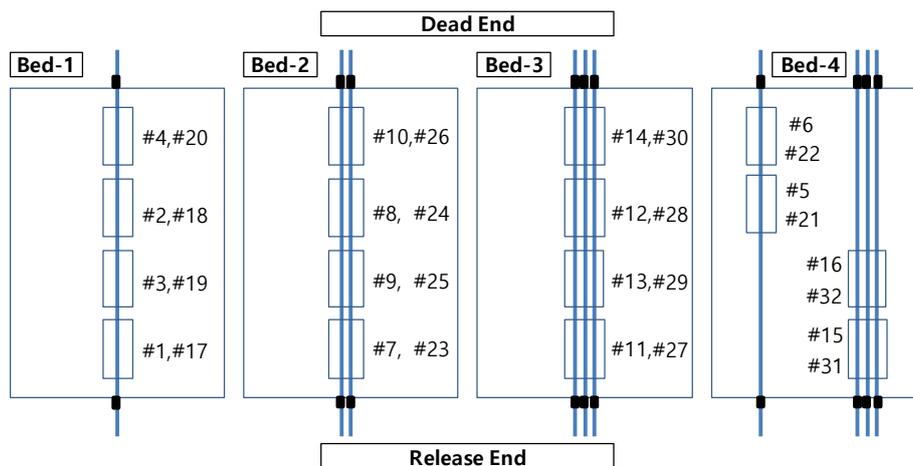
Prestressing beds and fabrication scheme for test specimens
